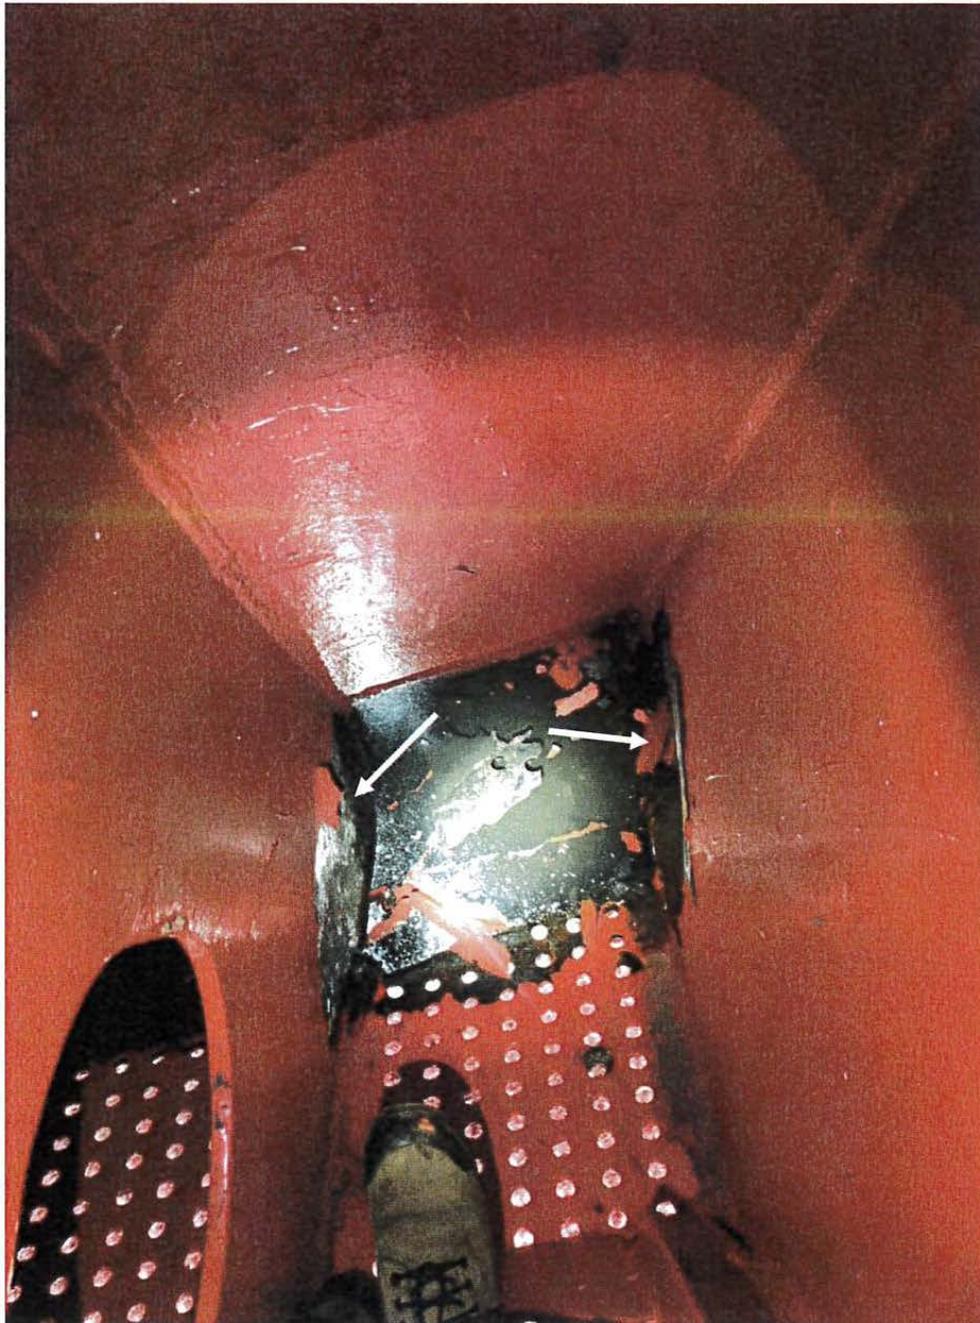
View of transverse floor plate in #2 FO Tank. Buckling of lower edge of floor plate consistent at each frame in way of damage.
